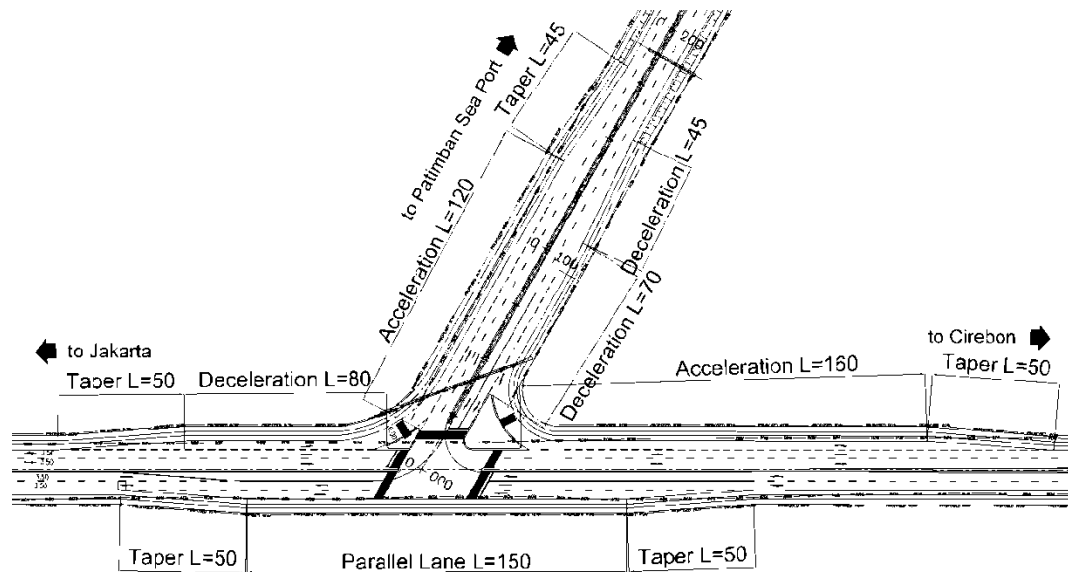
Size of Patimban Seaport Access Road and Bridge
